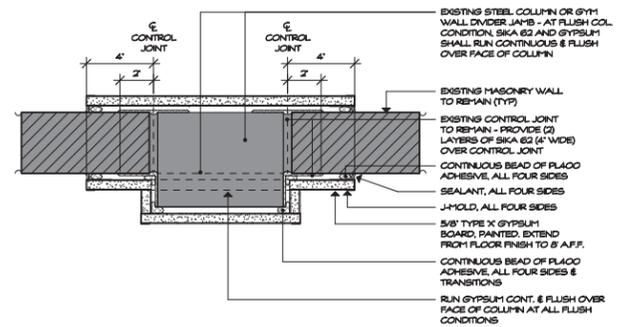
16.136 JFK Middle School - A1-Final PCB Expansion Joint
